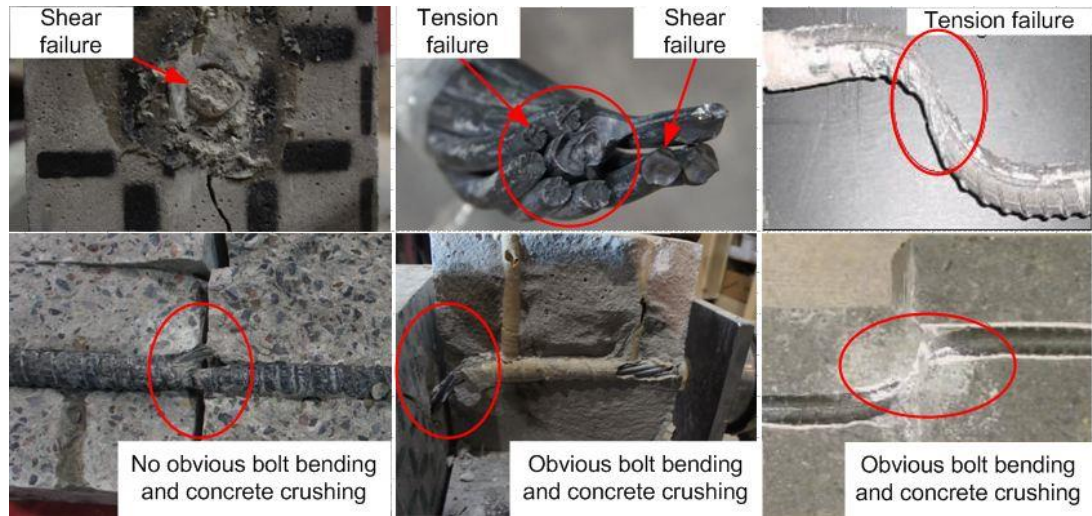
Failure modes of FG bolt, steel rebar bolt and cable bolt in reinforcing 40 MPa concrete joints
